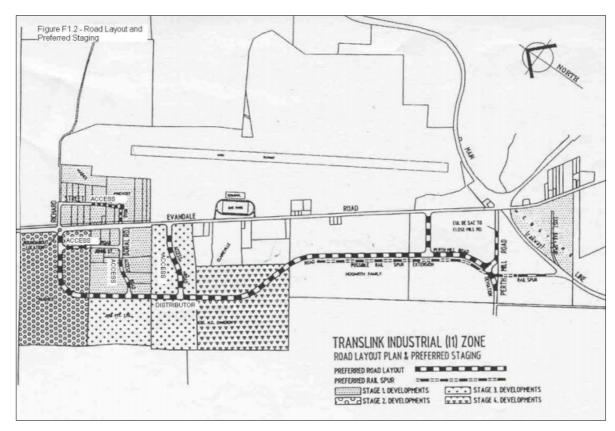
Road layout plan as required by clause NOR-S1.8.1
